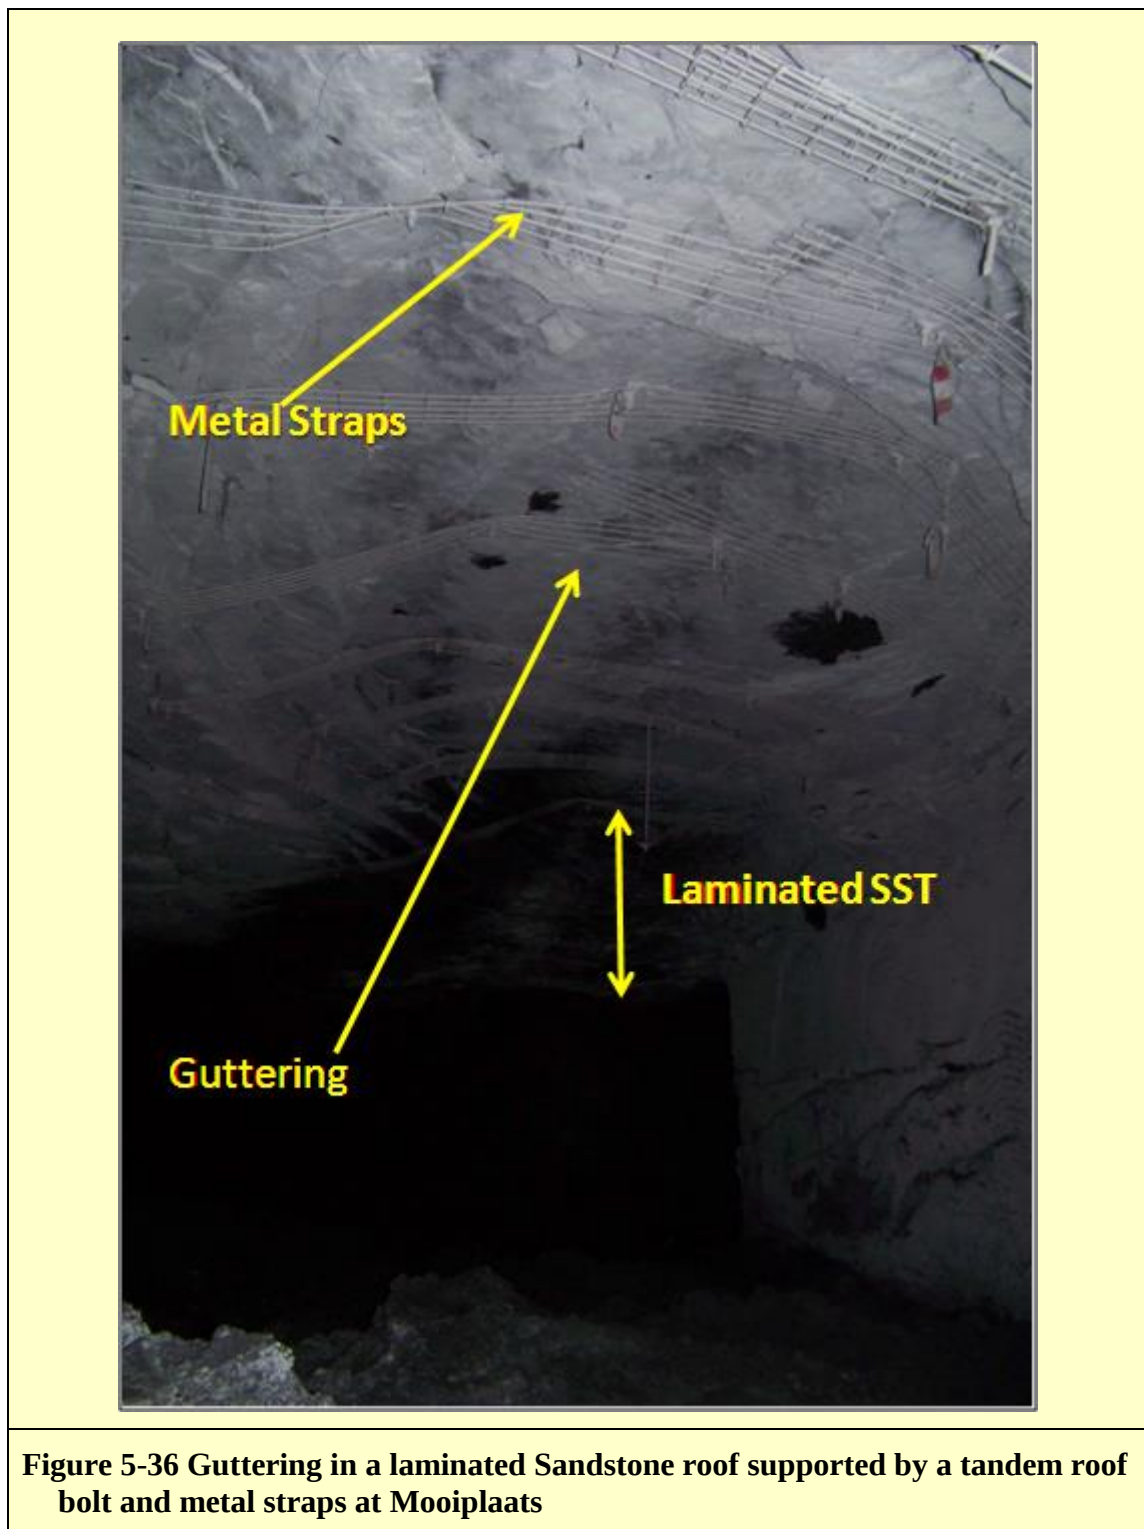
Guttering in a laminated Sandstone roof supported by a tandem roof bolt and metal straps at Mooiplaats
